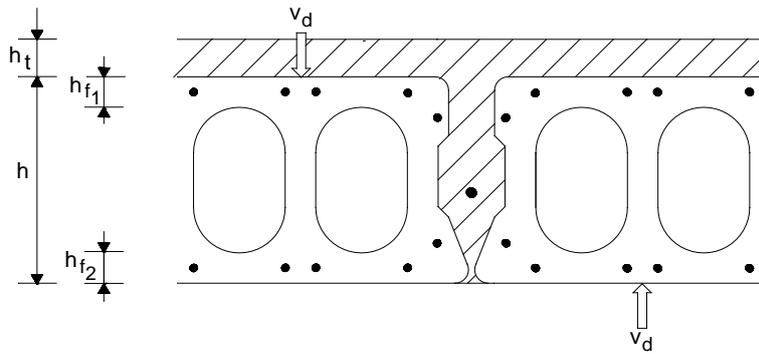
Shear force in joints of pre-stressed hollow core slabs
